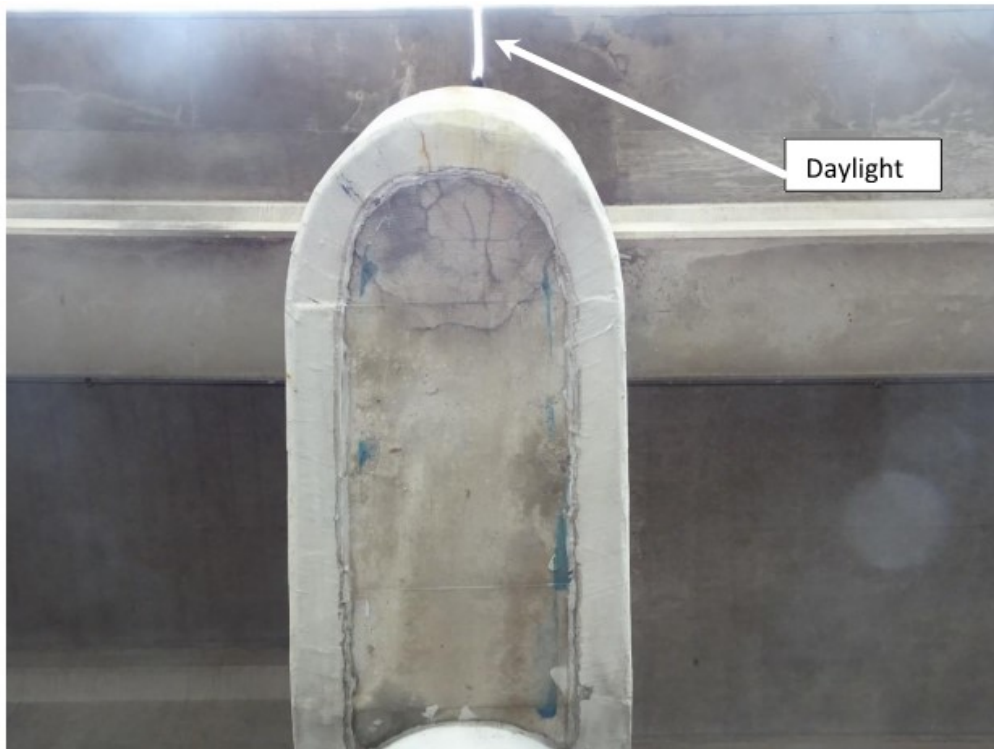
Pier 40WB - Daylight visible at a deck joint above the pier cap
